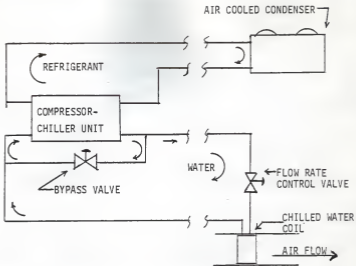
Compressor Chiller Unit--Chilled Water Coil--
